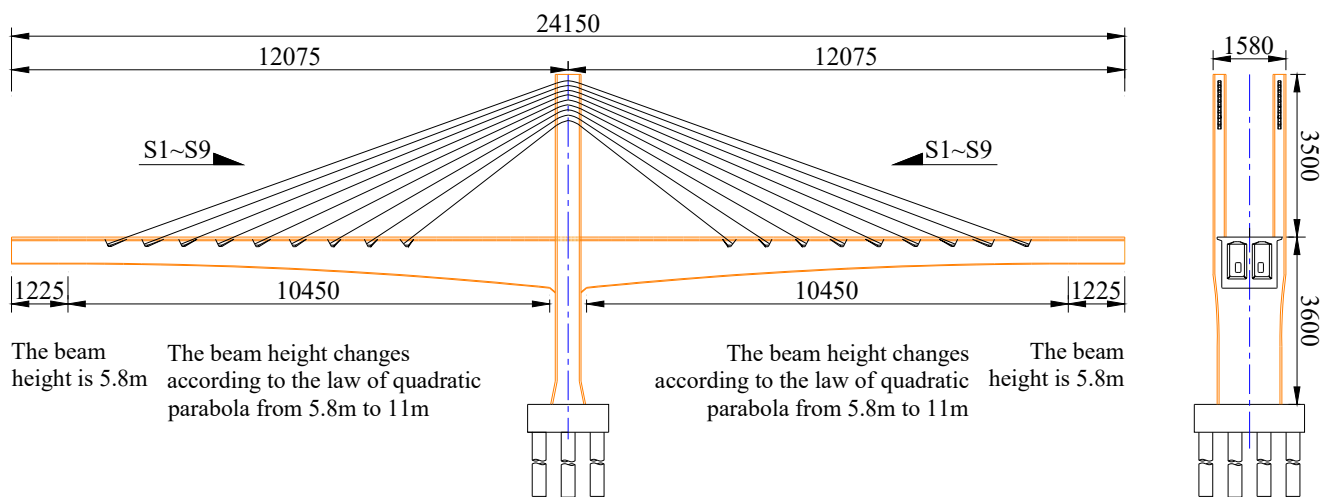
General layout of Nanxi River cable stayed T-frame bridge (unit: cm).
